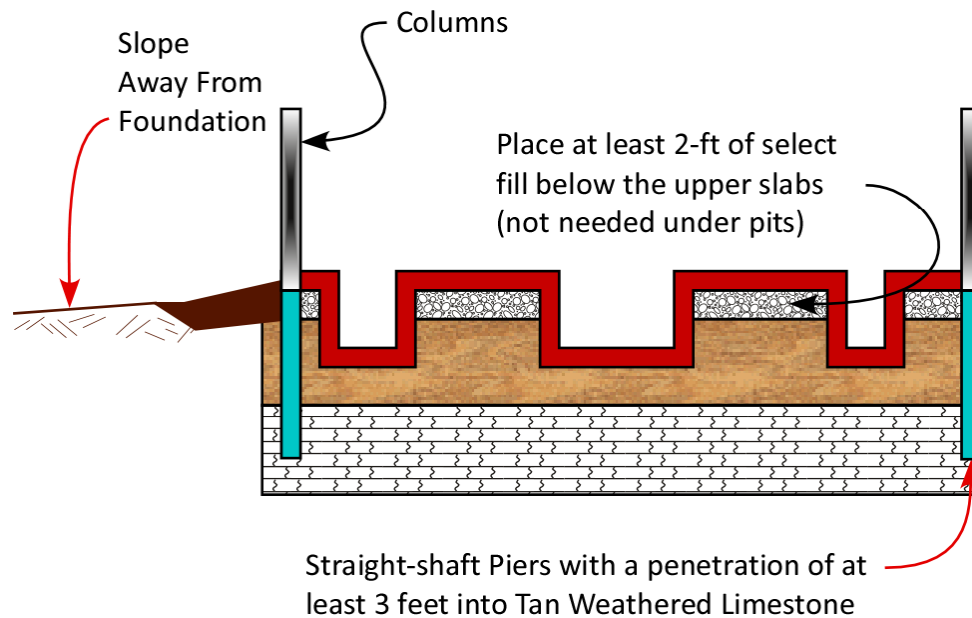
Sketch of Drilled Piers with a Slab on Grade (not to scale)
